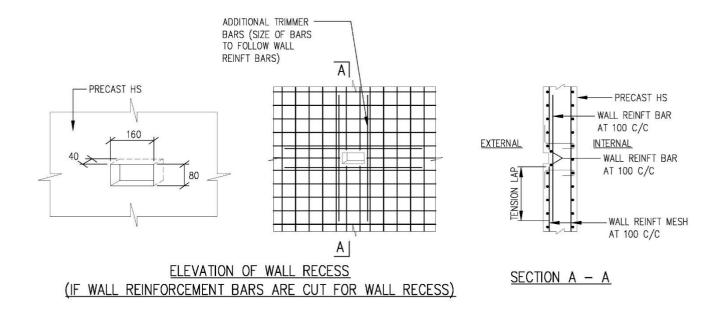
(i) DETAILS OF REINFORCEMENT BARS NEAR DOOR FRAME AND AT ELECTRICAL FIXTURES ON INTERNAL FACE OF PRECAST HS
